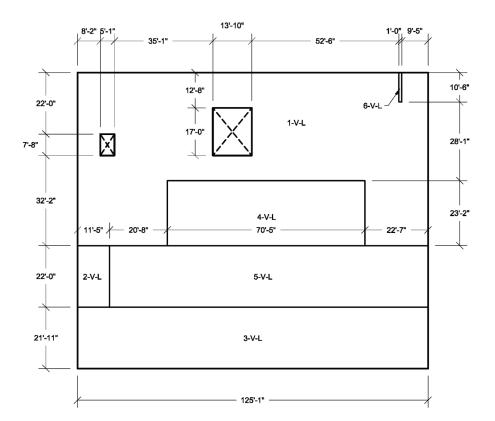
H.3-19 East Wall Looking West Vertical Reinforcement Zones Near Side Face
